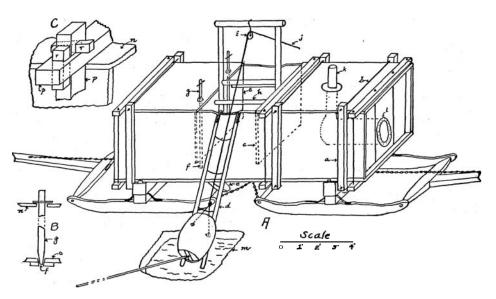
A. A Water Tank used to Sprinkle Iced Sled Roads. This tank is 4 feet high, 7 feet wide and 14 feet long and has a capacity of 390 cubic feet of water. The tank is made from $1\frac{1}{2}$ -inch plank. a. Frame timber 4 by 4 inches in cross section. b. A $\frac{3}{4}$ -inch brace rod. c. Interior partition to prevent the splashing of the water. d. Barrel ladder. e. Sheet iron trough for deflecting the water to the ruts. f. Holes in the bottom of the tank just over the trough "e." g. Plugs by means of which the holes "f" may be opened: and closed. h. A bumper which prevents the barrel from falling into the tank. i. Hoisting block. j. Hoisting cable, $\frac{3}{4}$ -inch. k. Stack of tank heater. 1. Fuel door for tank heater. m. Water hole in a stream. B. Details of the water plug "g." n. Roof of water tank. o. Floor of water tank. C. Details of a wooden frame for a water tank which is sometimes used instead of that shown in "A." p. Frame timbers. r. Wooden wedges.
